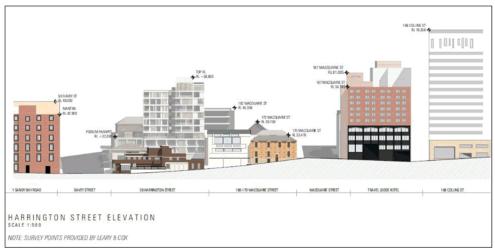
Harrington Street streetscape (source: JAWS Architects)
